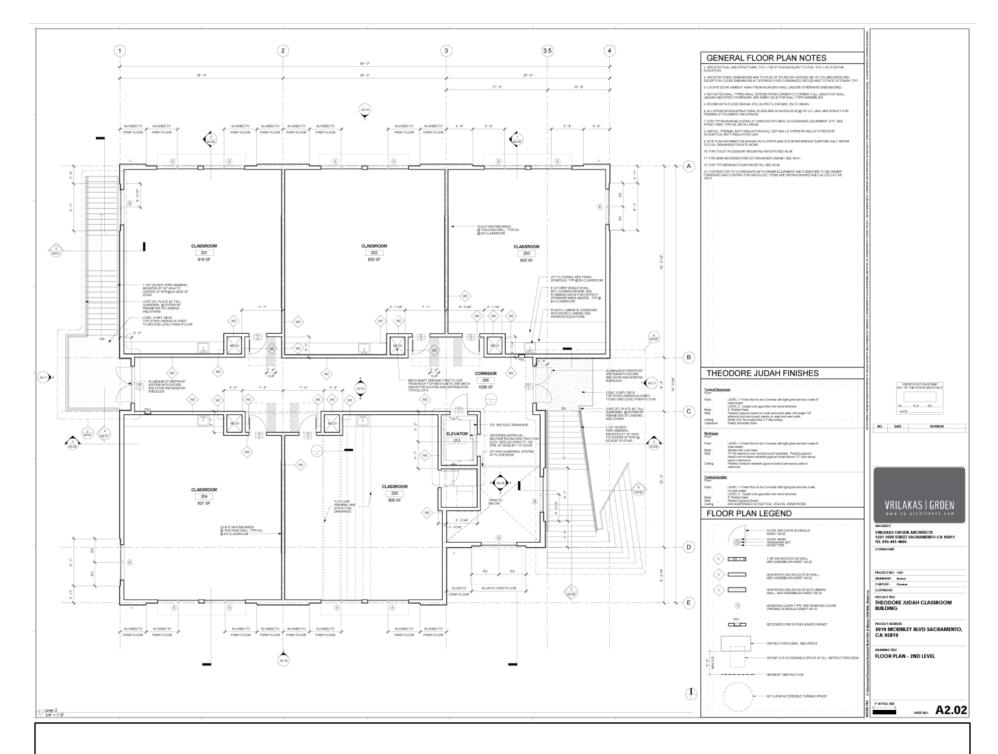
FLOOR PLAN - SECOND FLOOR
